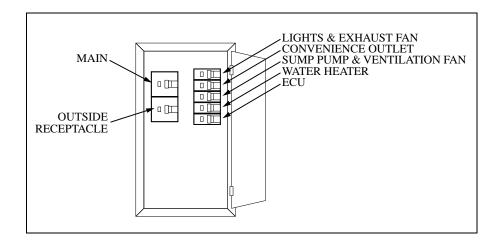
Circuit breaker panel inside the Containerized Latrine
